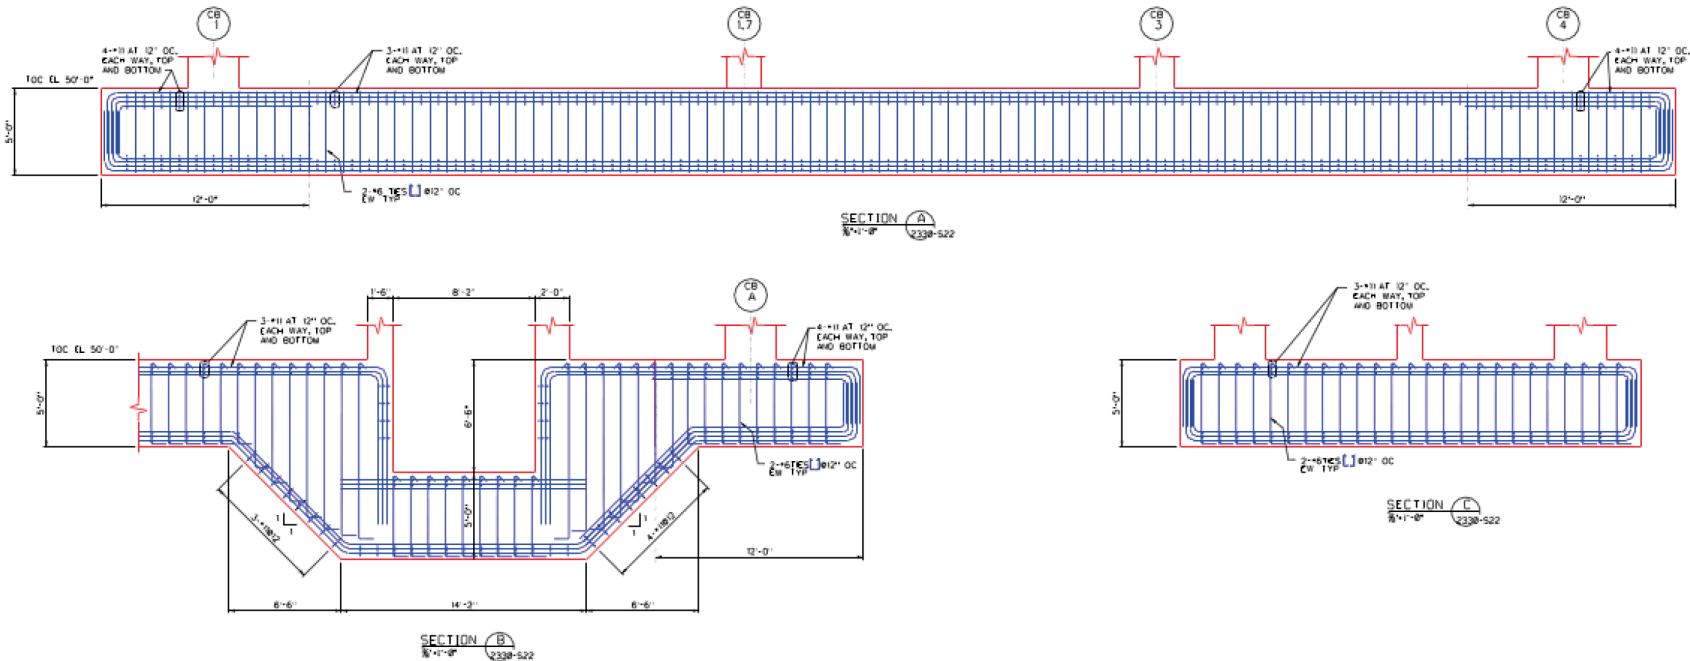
B-76: Cross Section of CRB Basemat Showing Reinforcing Steel
